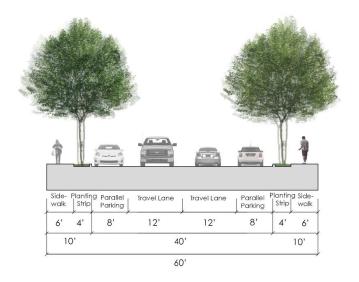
North Pioneer Street Section as seen in the Downtown Master Plan
